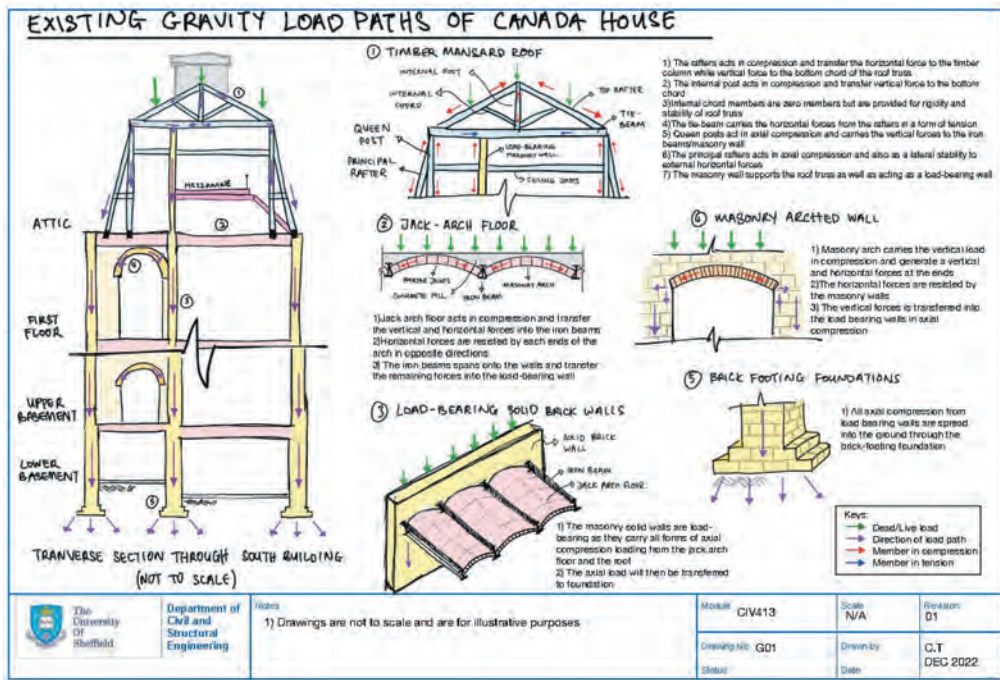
Cross section through Canada House, showing proposed vertical extension and load paths, as well as typical construction details (CIV413 Module Students, University of Sheffield).
